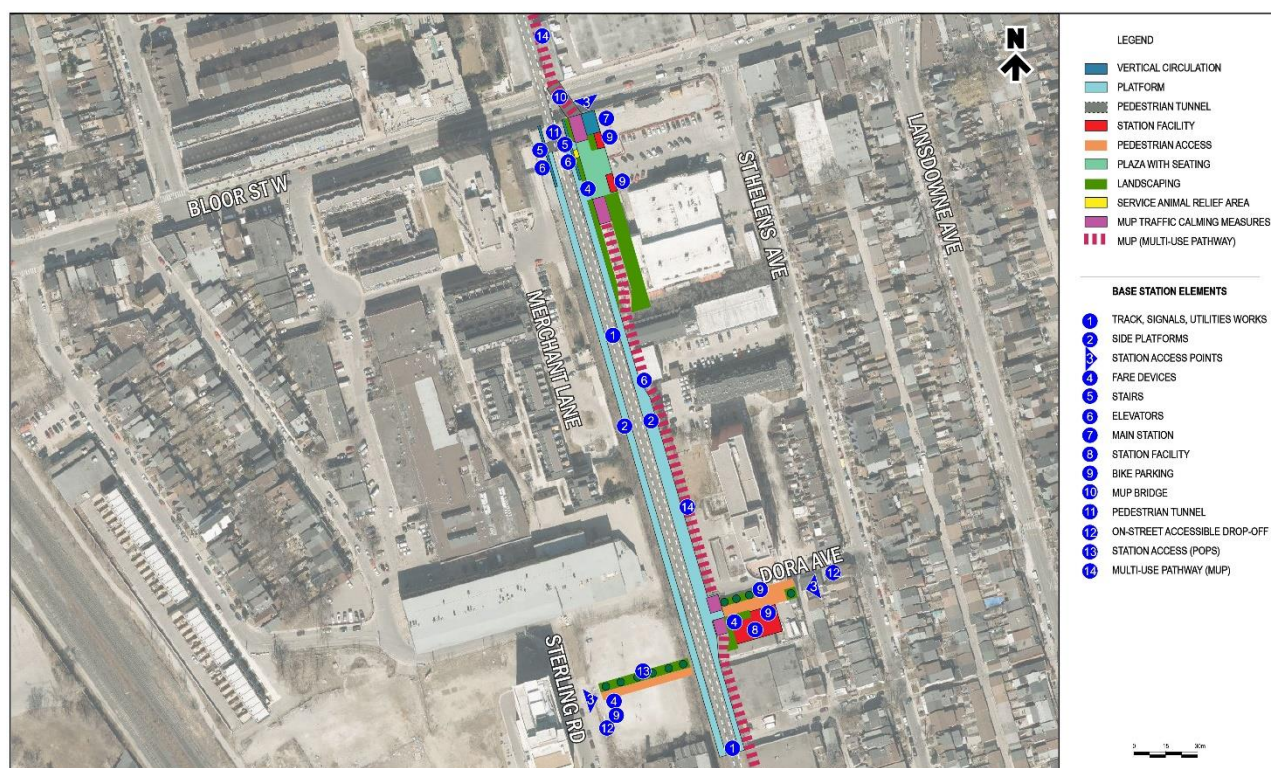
Conceptual plan of Bloor-Lansdowne Station. Source: City of Toronto (Based on site plan by Metrolinx, February 2023). Note: Station plan shown above is indicative and does not represent a final design.
